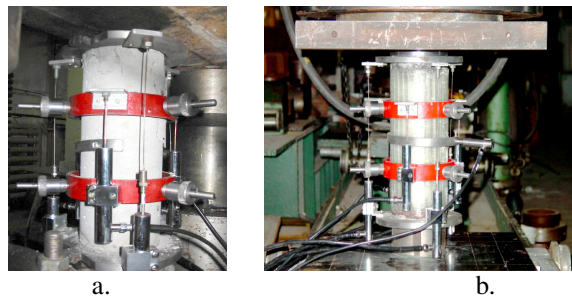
Instrumentation of test samples with LVDTs a. unconfined concrete cylinder specimen; b. confined concrete cylinder specimen
